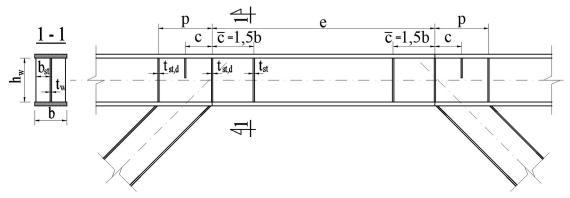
Arrangement of transverse stiffeners to long dissipative bars
